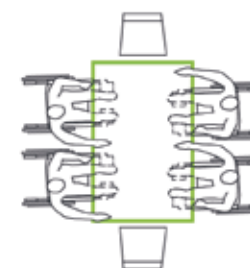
key dimensions of accessible tables, (source: building bulletin 91)
